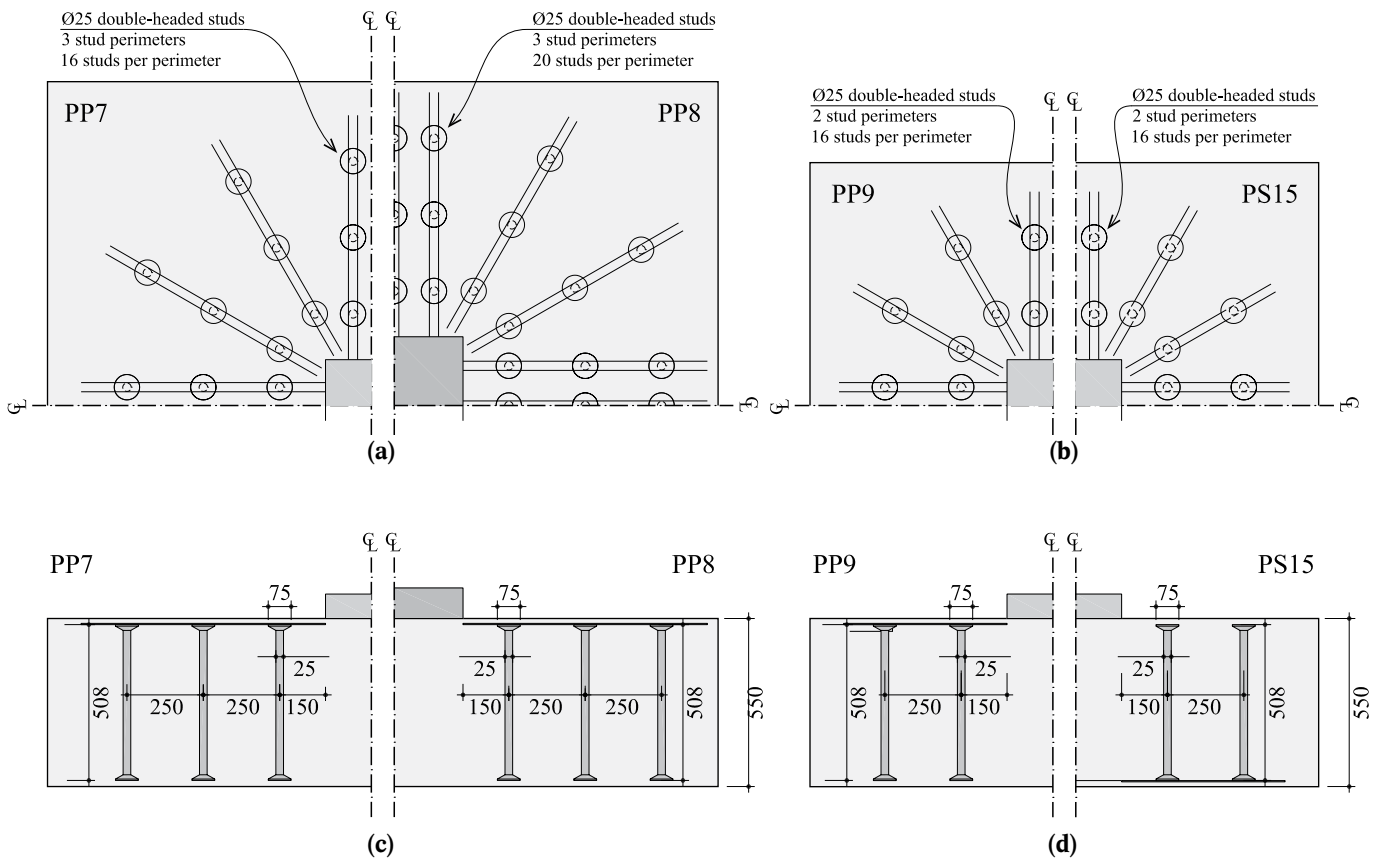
Layout of shear reinforcement: a) plan of PP7 and PP8, b) plan of PP9 and PS15, c) section through PP7 and PP8, and d) section through PP9 and PS15
